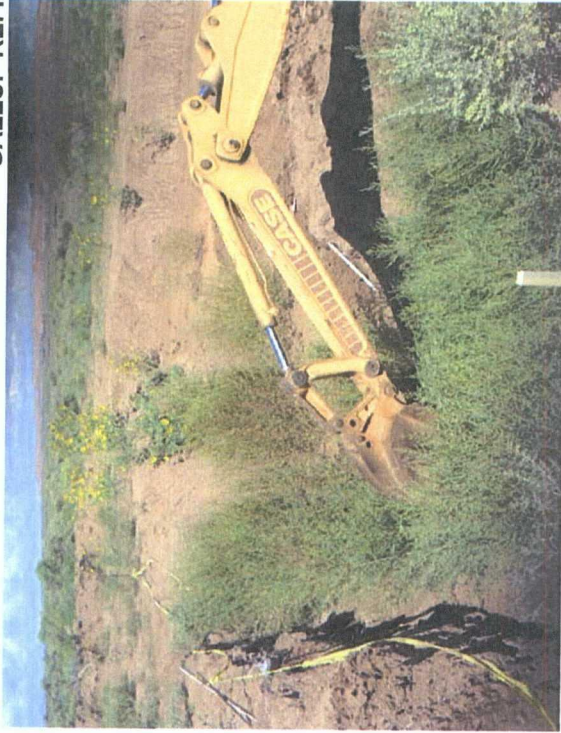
Collecting Confirmation Soil Sample CS-40, looking northwest
